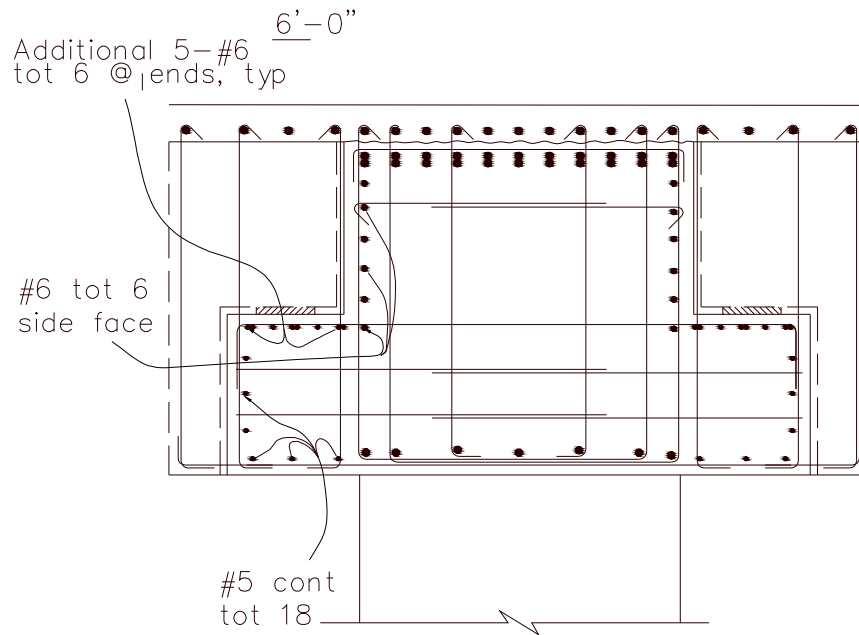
Longitudinal corbel reinforcement at the exterior girder
